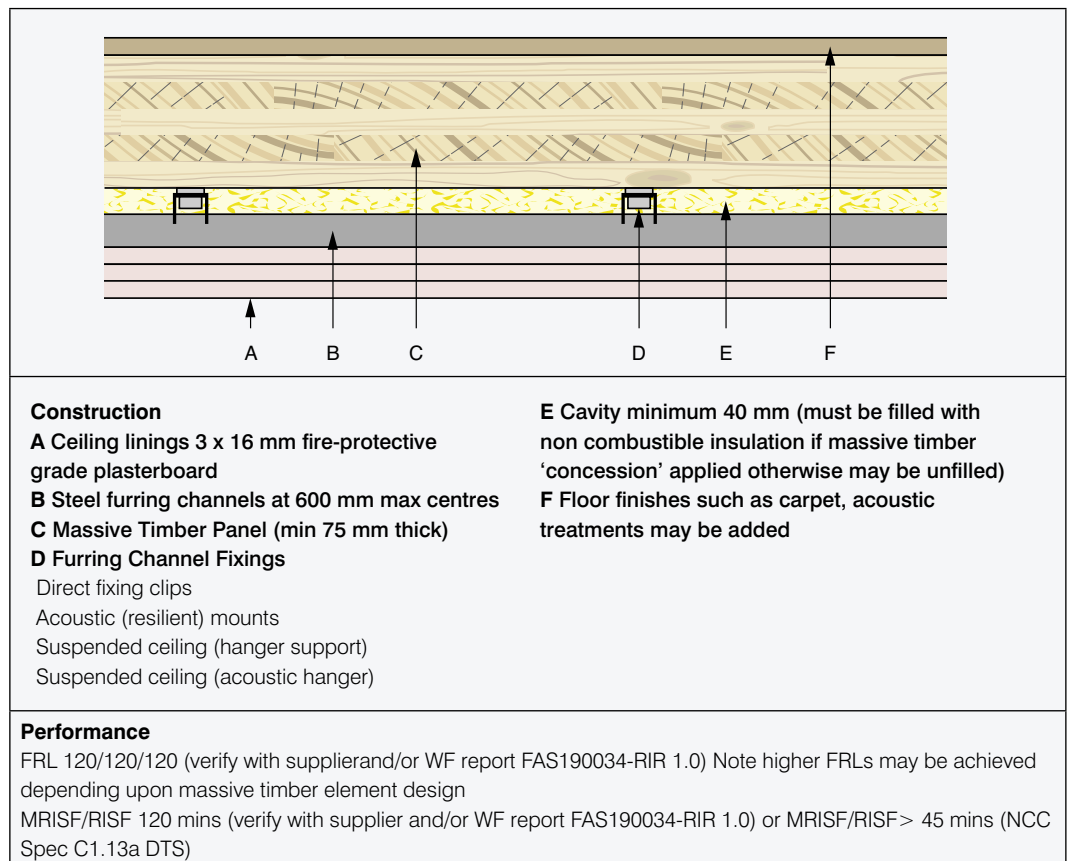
FRL 120/120/120 Massive timber floor system. Plasterboard is not direct fix and therefore massive timber concession does not apply and RISF 45 is applicable.
